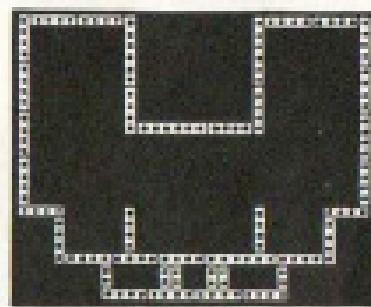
Detail of floor of balcony. Half bricks spanning the spaces of the columns sit on top of three layers.
